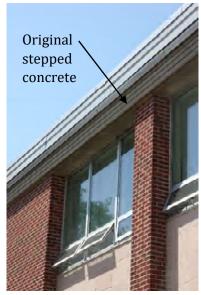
AJM Johnson Hall at MSU-Bozeman, with increased parapet height after roofing project completed in 2017.
